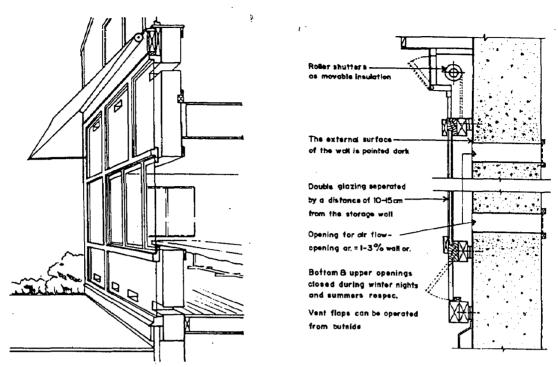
Construction detail of a Trombe wall. (Bansal, 1994)
